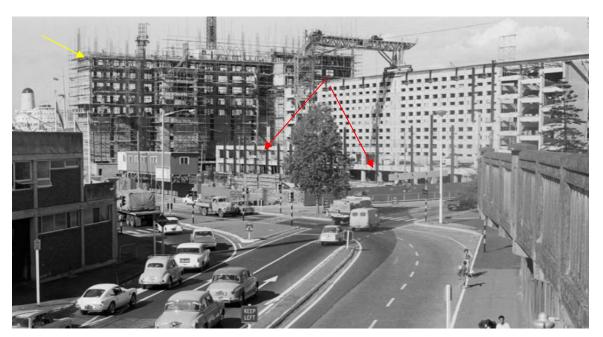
Photograph taken in 1970 looking northeast along Sturdee Street with the Downtown Carpark under construction (indicated by red arrows) and Travelodge Hotel also under construction, indicated by yellow arrow (source: Auckland Libraries Heritage Collections, 786-A21-05)
